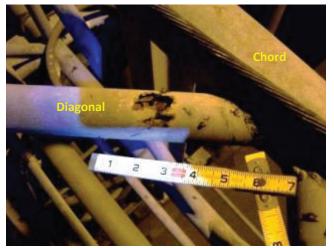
Area of 100% section loss in upper diagonal member of chord truss
